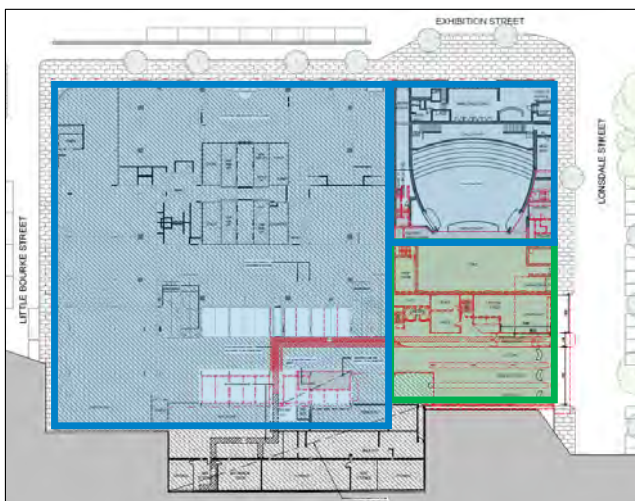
Confined area (green) of potentially vacant land and retained buildings on-site (blue)
